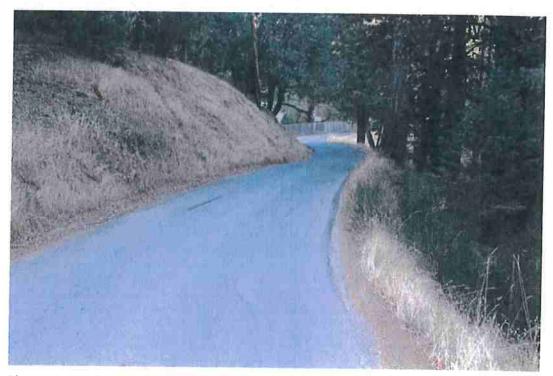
Mile 3.0: 15-ft road width with 1-ft shoulders.
